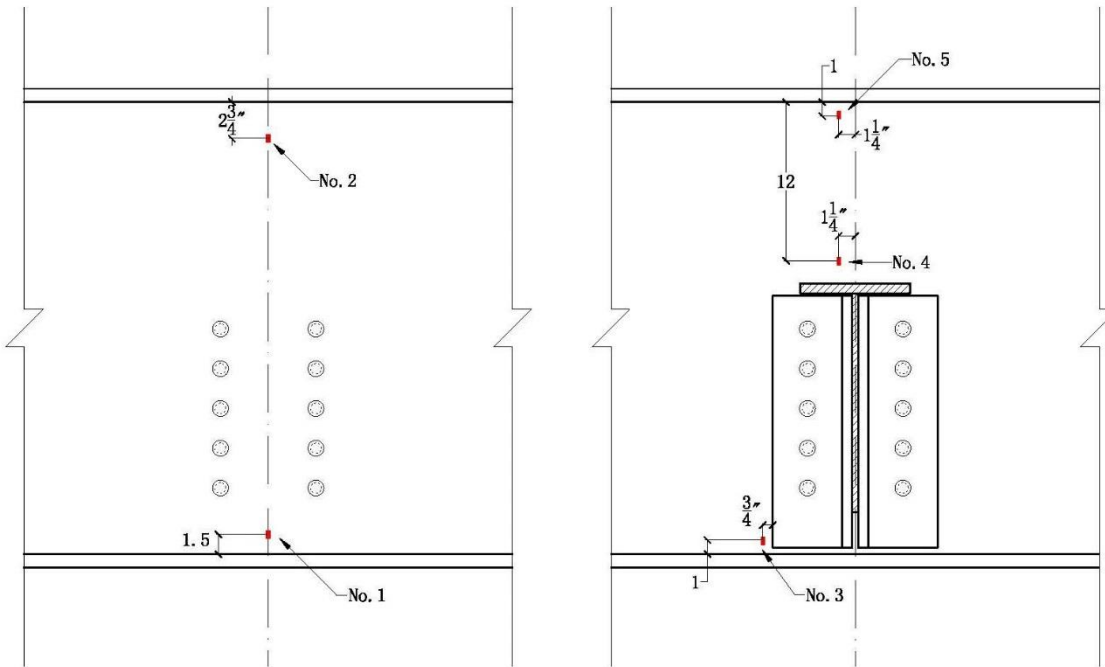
Strain gage placements of double-angle connection (specimen FS2) at floorbeam web
